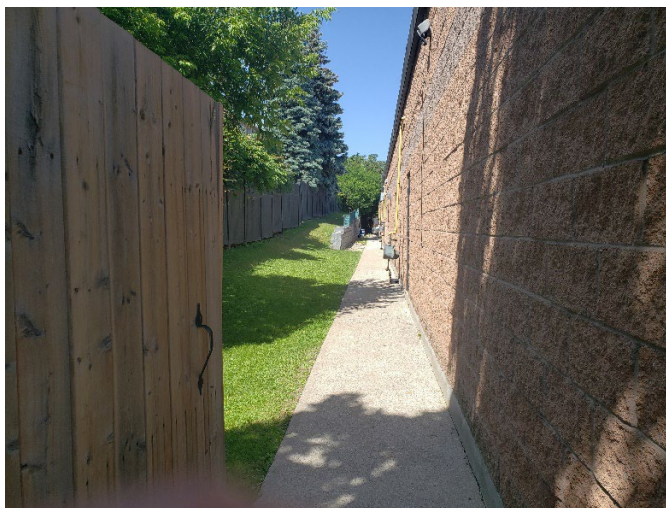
View of northwest side of 801 Dundas St E building, from southwest
